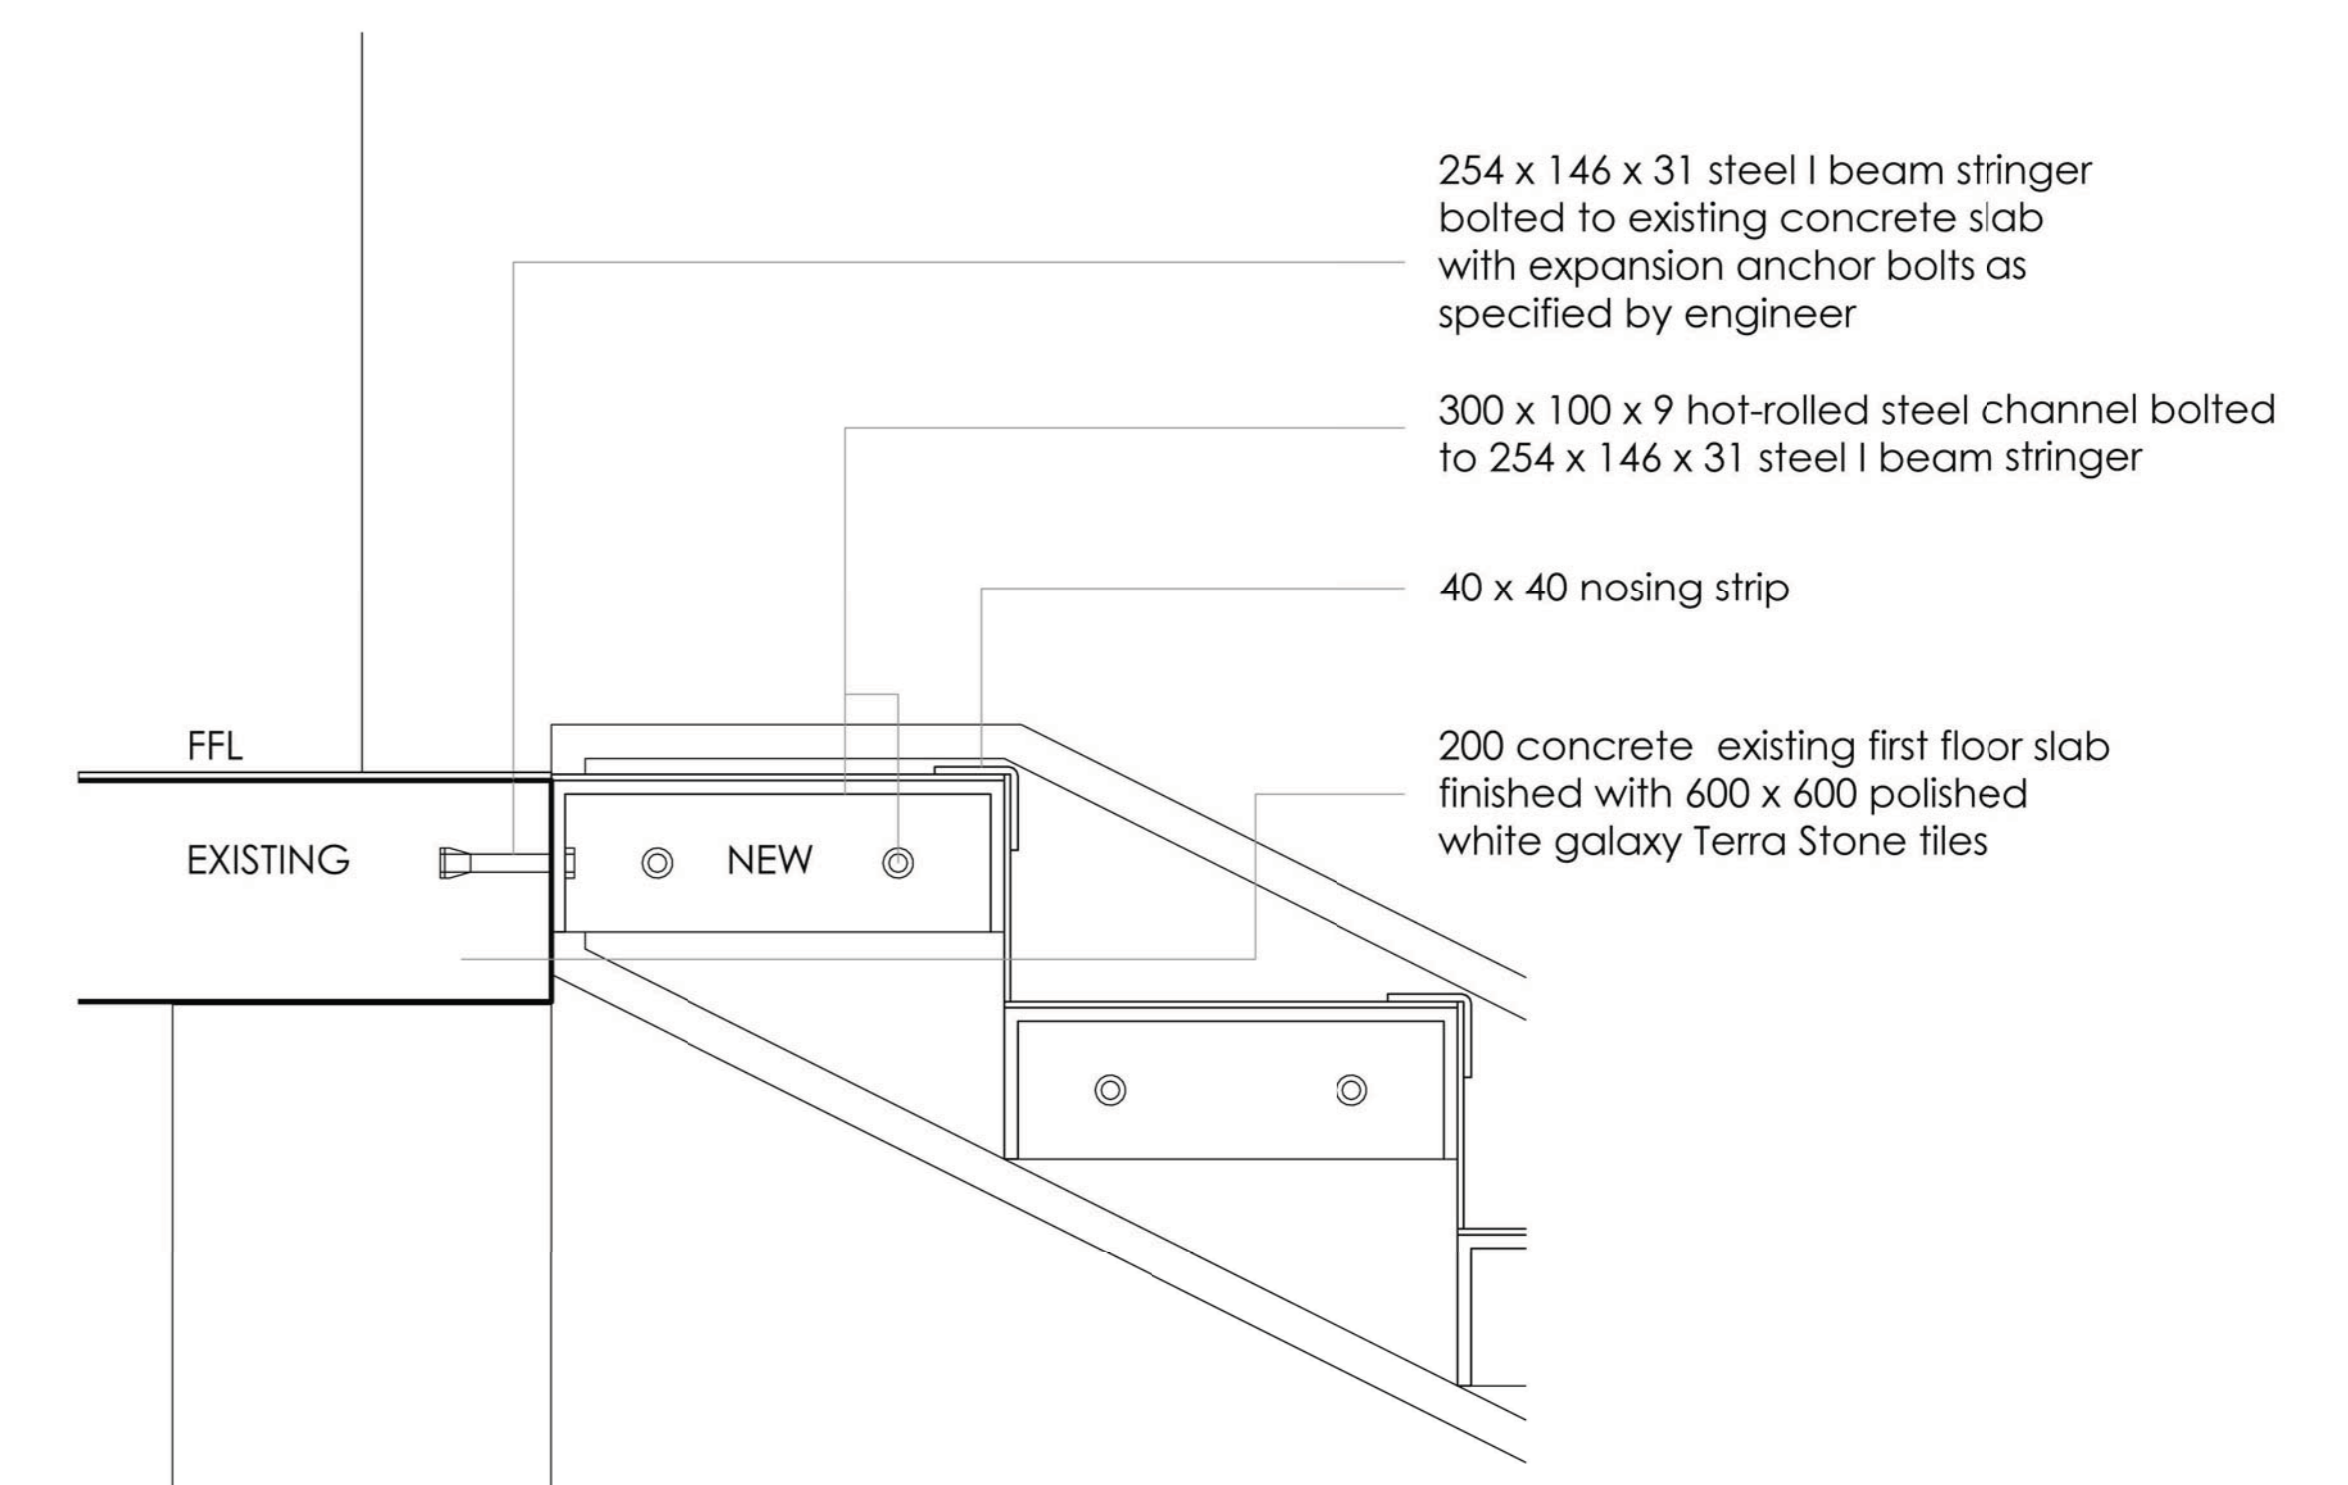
Staircase detail illustrating an example of a typical new to existing joint
